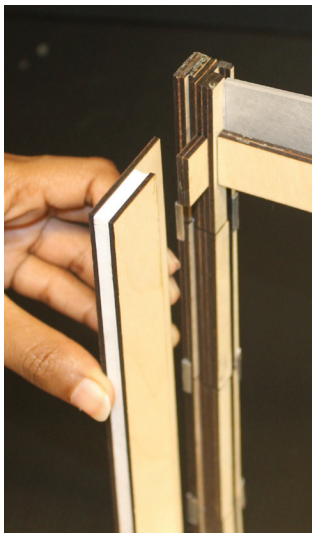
Methods of assembly shown through 1:10 test model: concertina of the floor; sliding connections at the beam; sliding connections at the column
